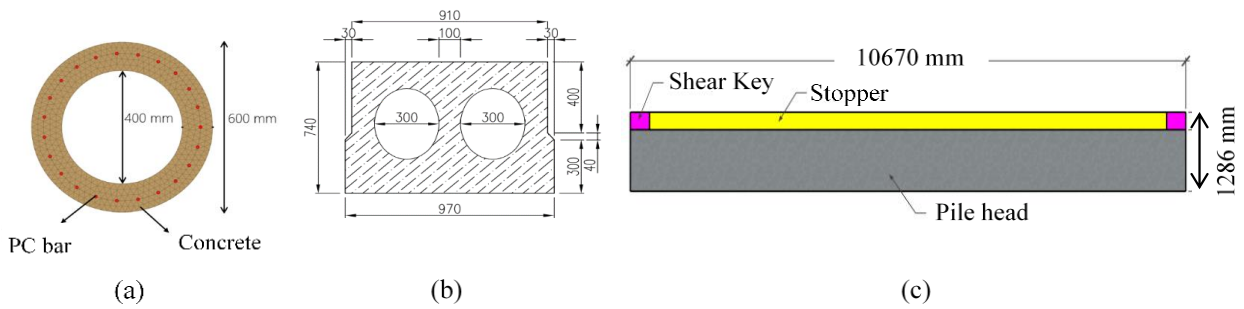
Cross-Section: (a) Spun Pile; (b) Hollow Slab; (c) Pile Head
